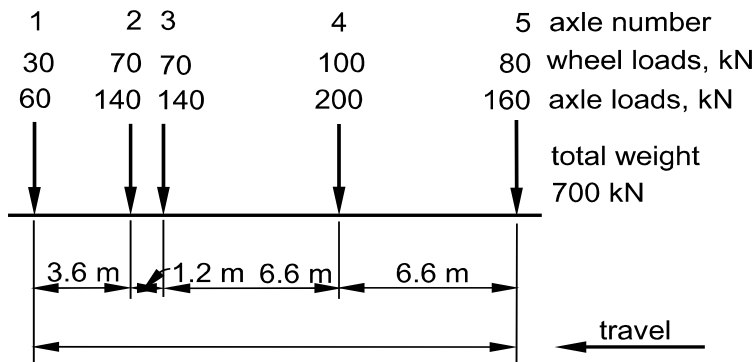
The 1979 Ontario Highway Bridge Design Truck
